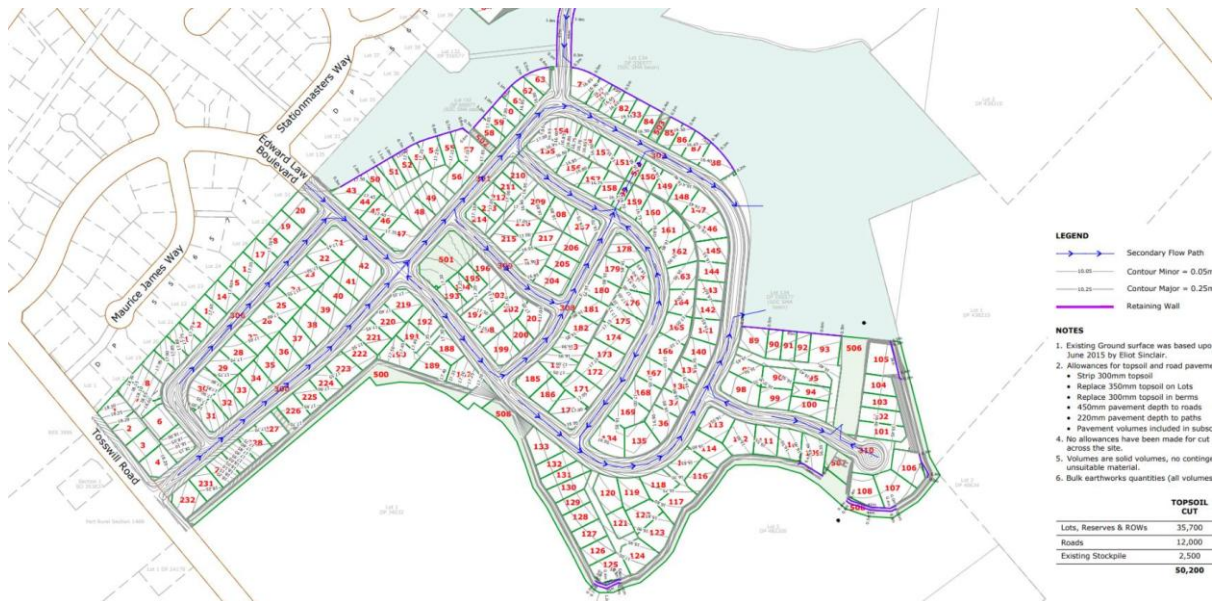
Drawing C1-C102 Design Ground Level Contour Plan - Retaining walls show in purple
